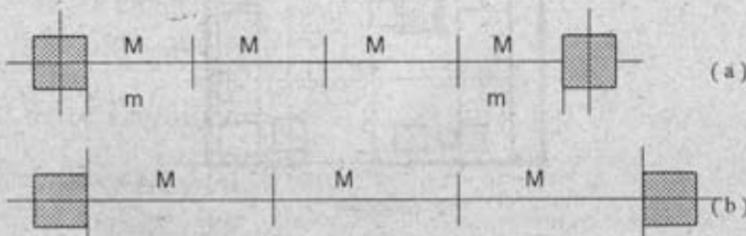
PLANNING MODULE WITH WALL AND COLUMN
